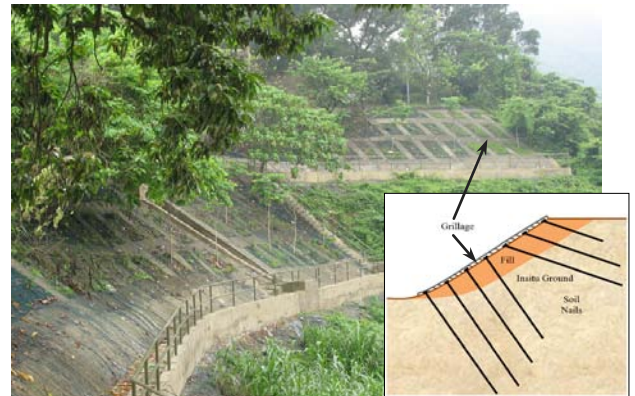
Upgrading of loose fill slopes by means of soil nails and concrete grillage beams
